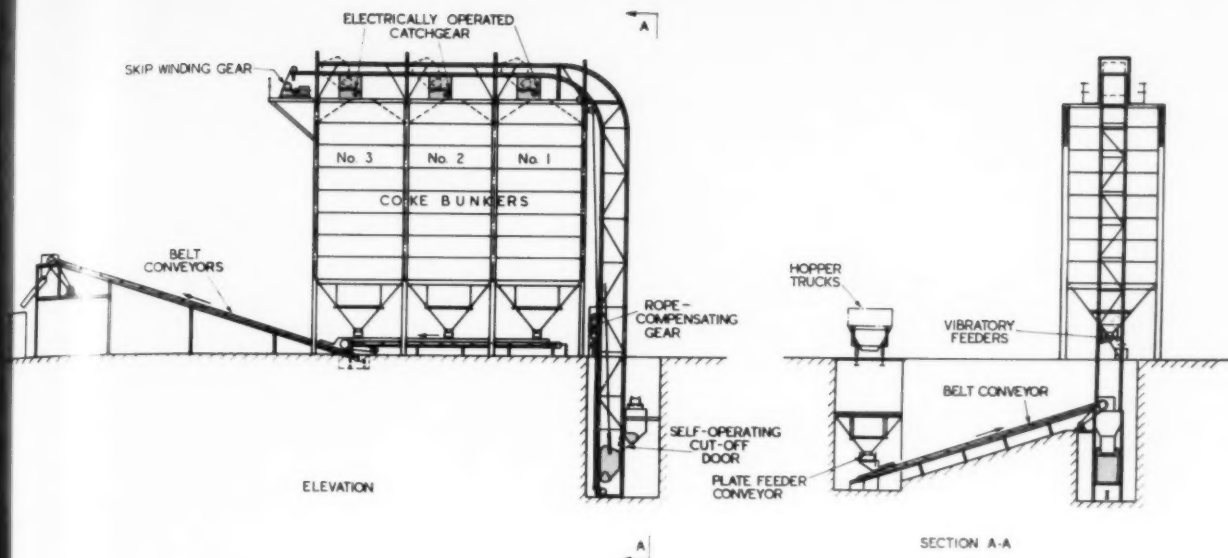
Travelling skip arrangement for handling coke at an ingot mould furnace plant
